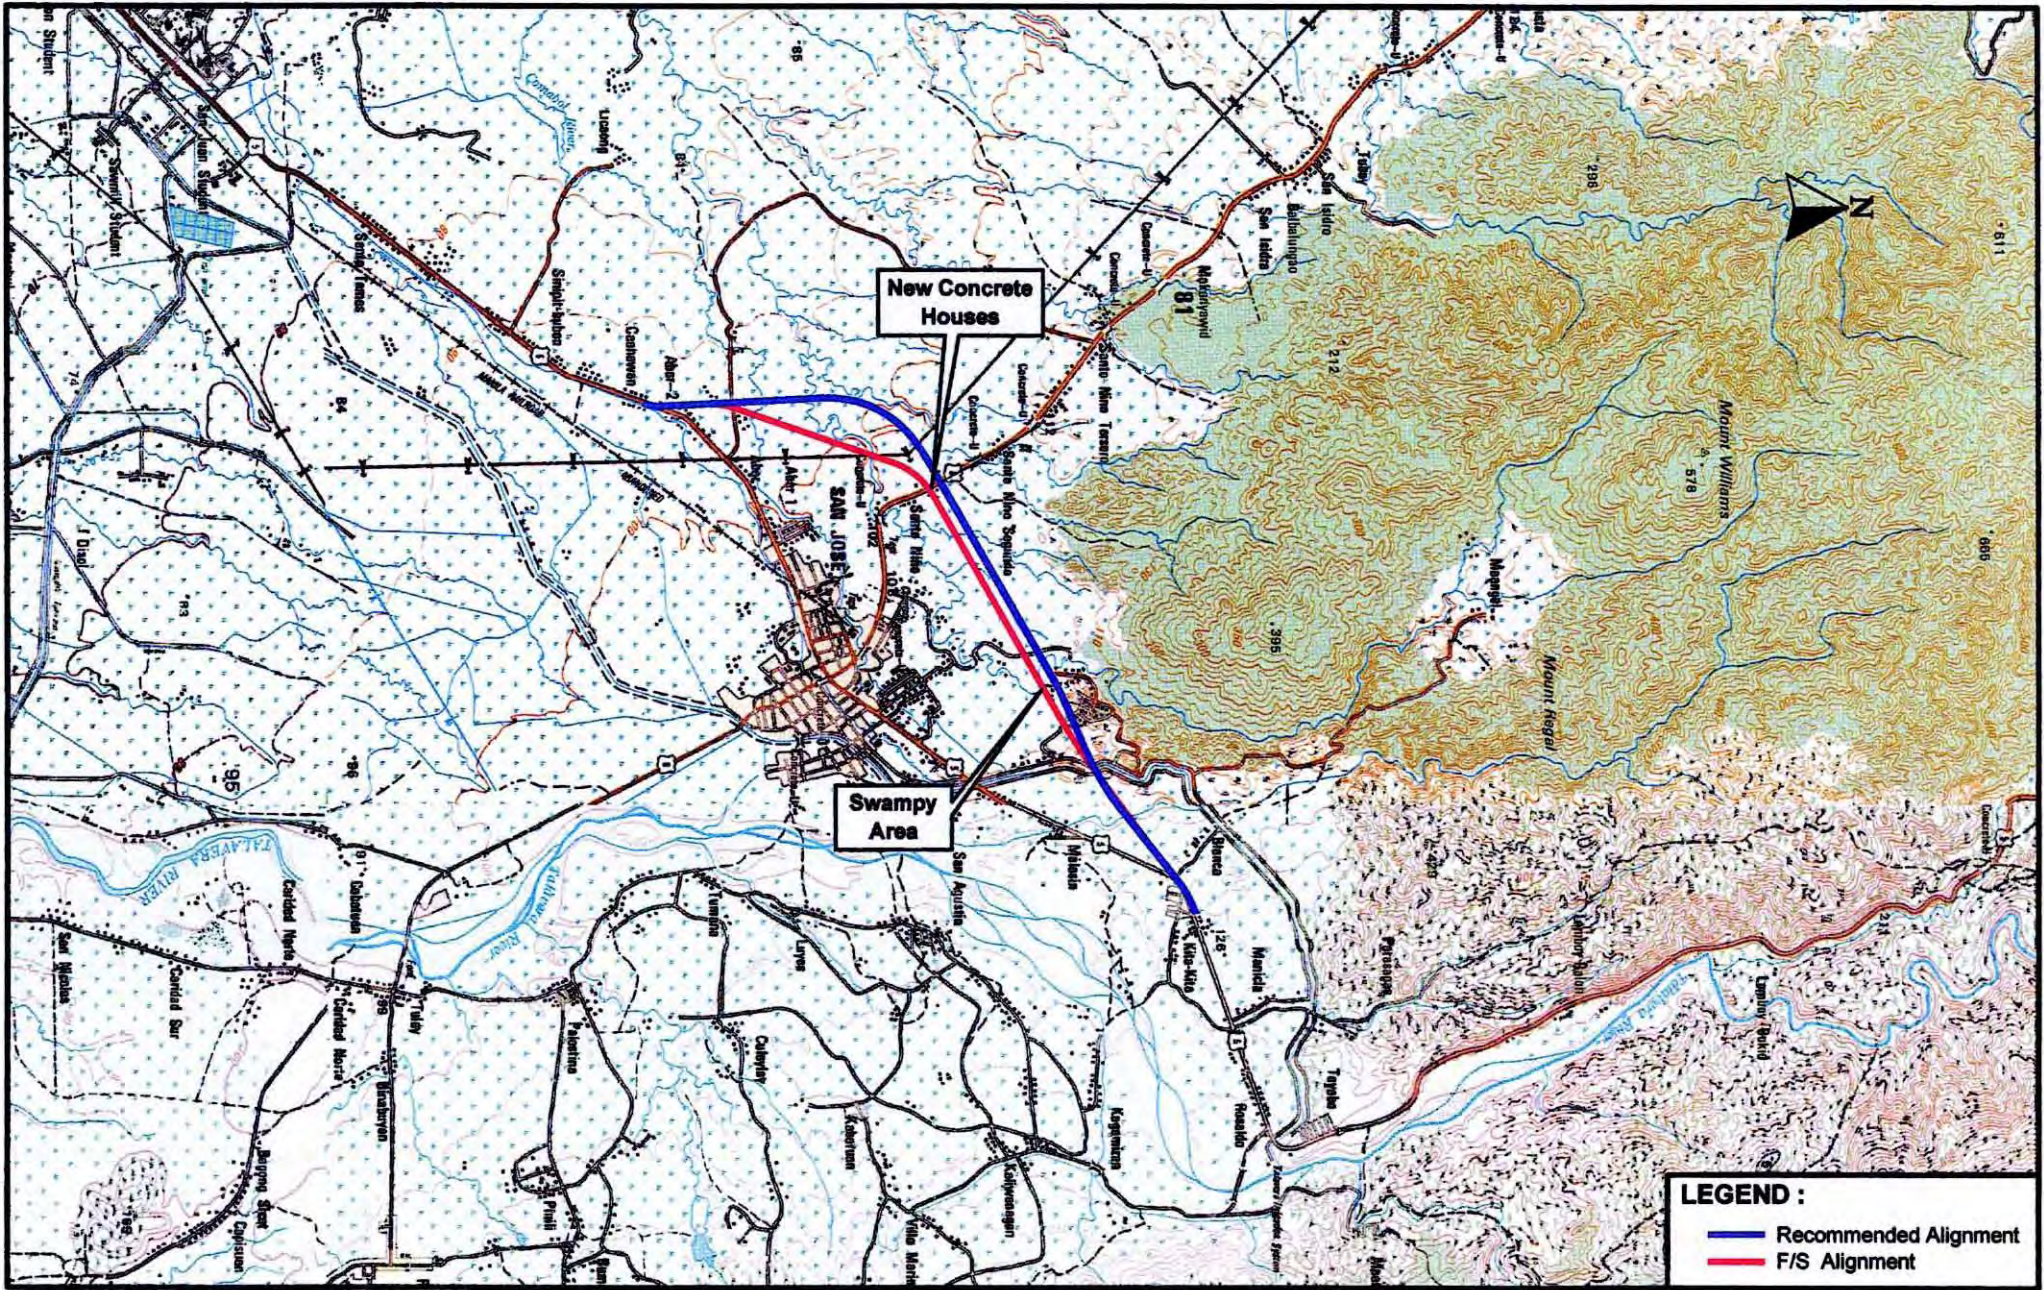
RECOMMENDED ALIGNMENTS FOR SAN JOSE BYPASS
